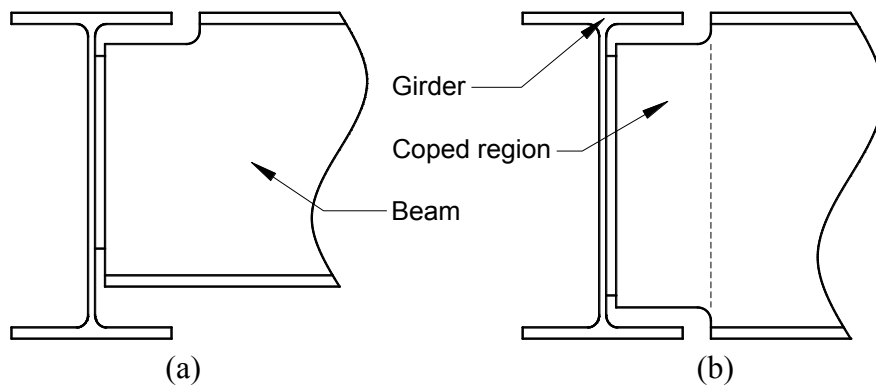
Beam coped at (a) top flange only and (b) both flanges
